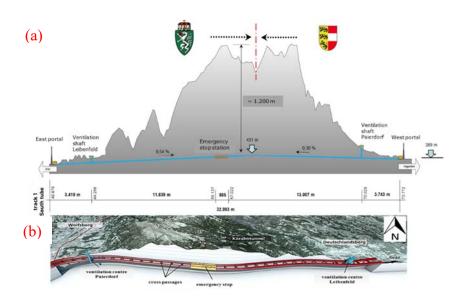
KAT tunnel system - (a) longitudinal section, (b) general scheme [16].
